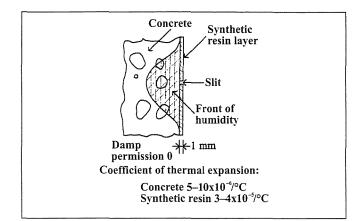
The water front spreads below the damaged resin layer, it can not dry out
